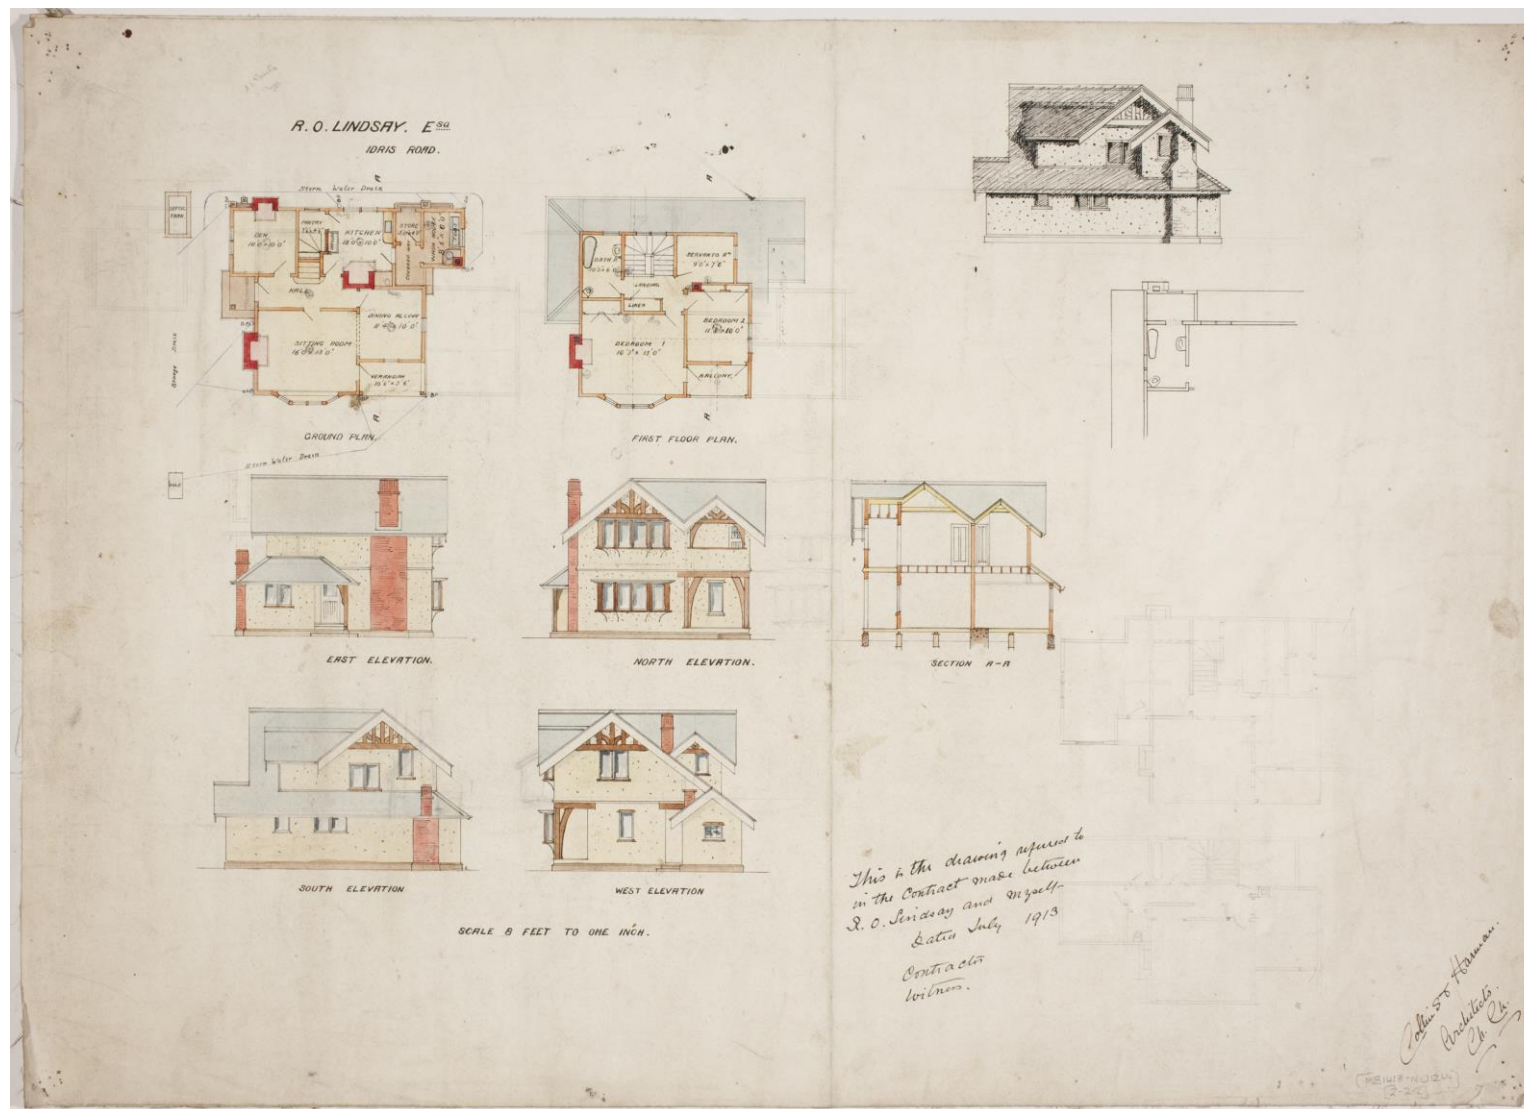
Collins and Harman, R. O. Lindsay, Esq., Idris Road, plans, elevations and section (1913).
